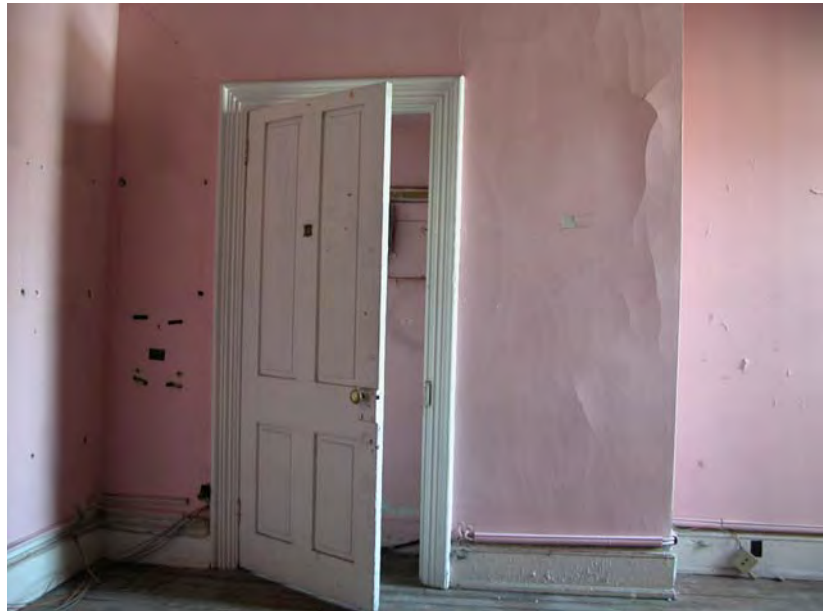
Hairline cracks at south wall. (Photo: BBB, 2007)
